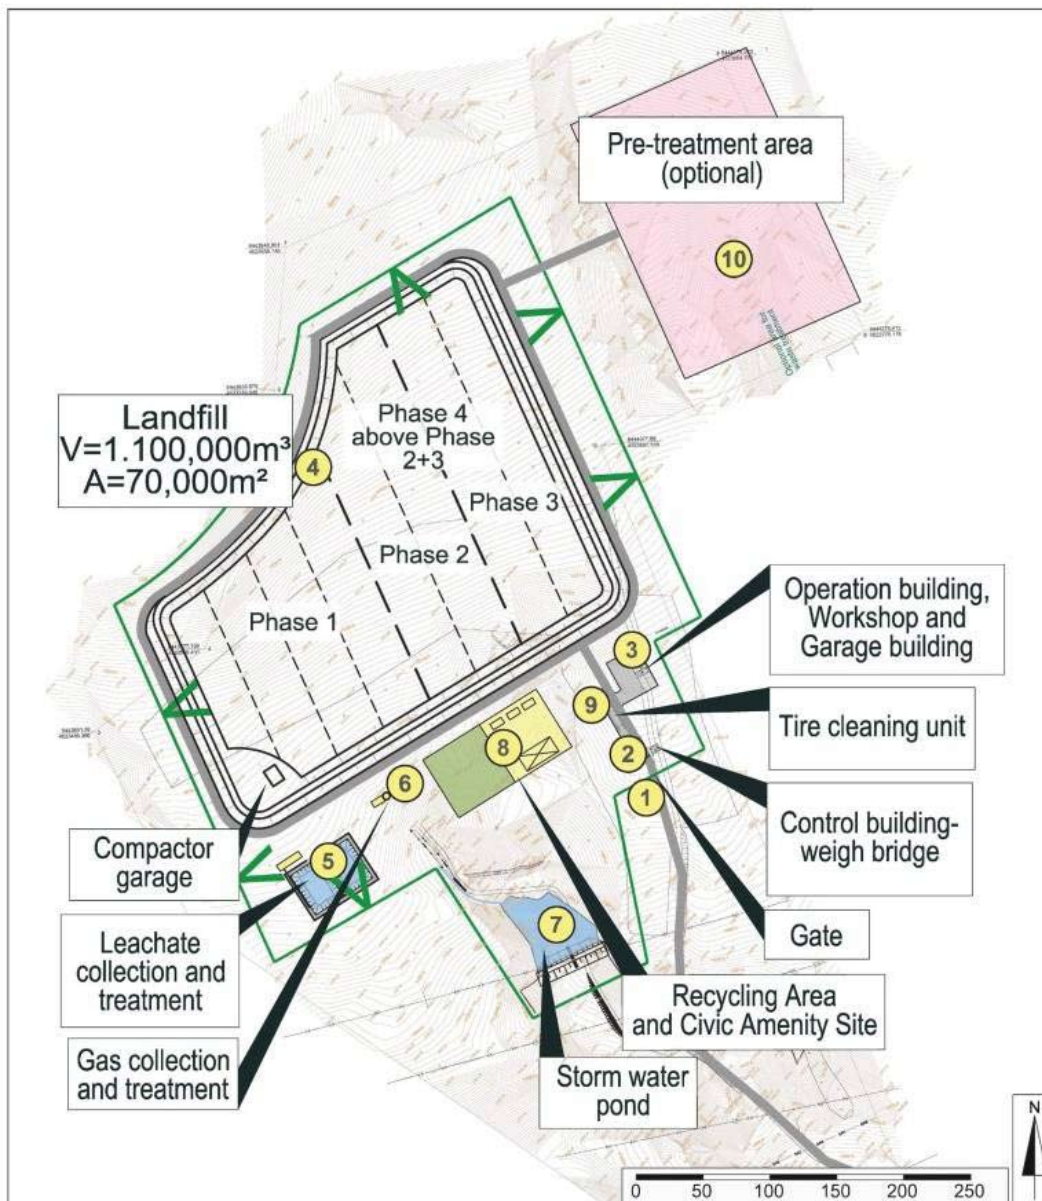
Typical Sanitary Landfill Layout with Facilities
